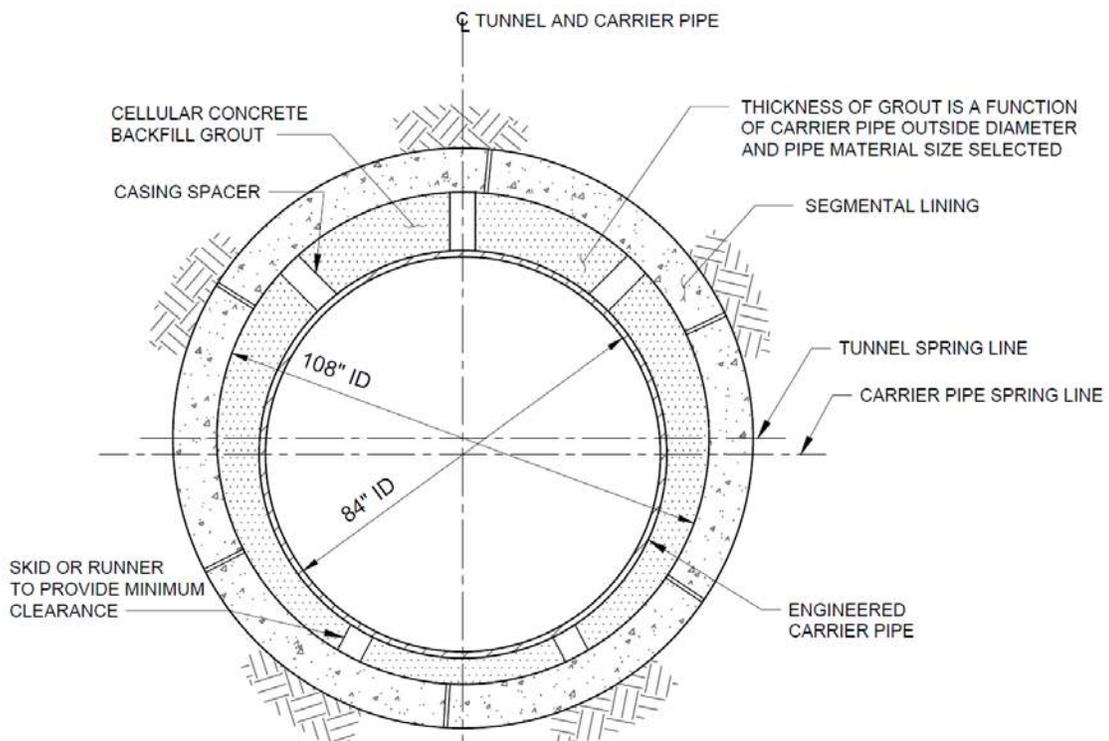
Typical initial tunnel lining and carrier pipe configuration for tunneling
